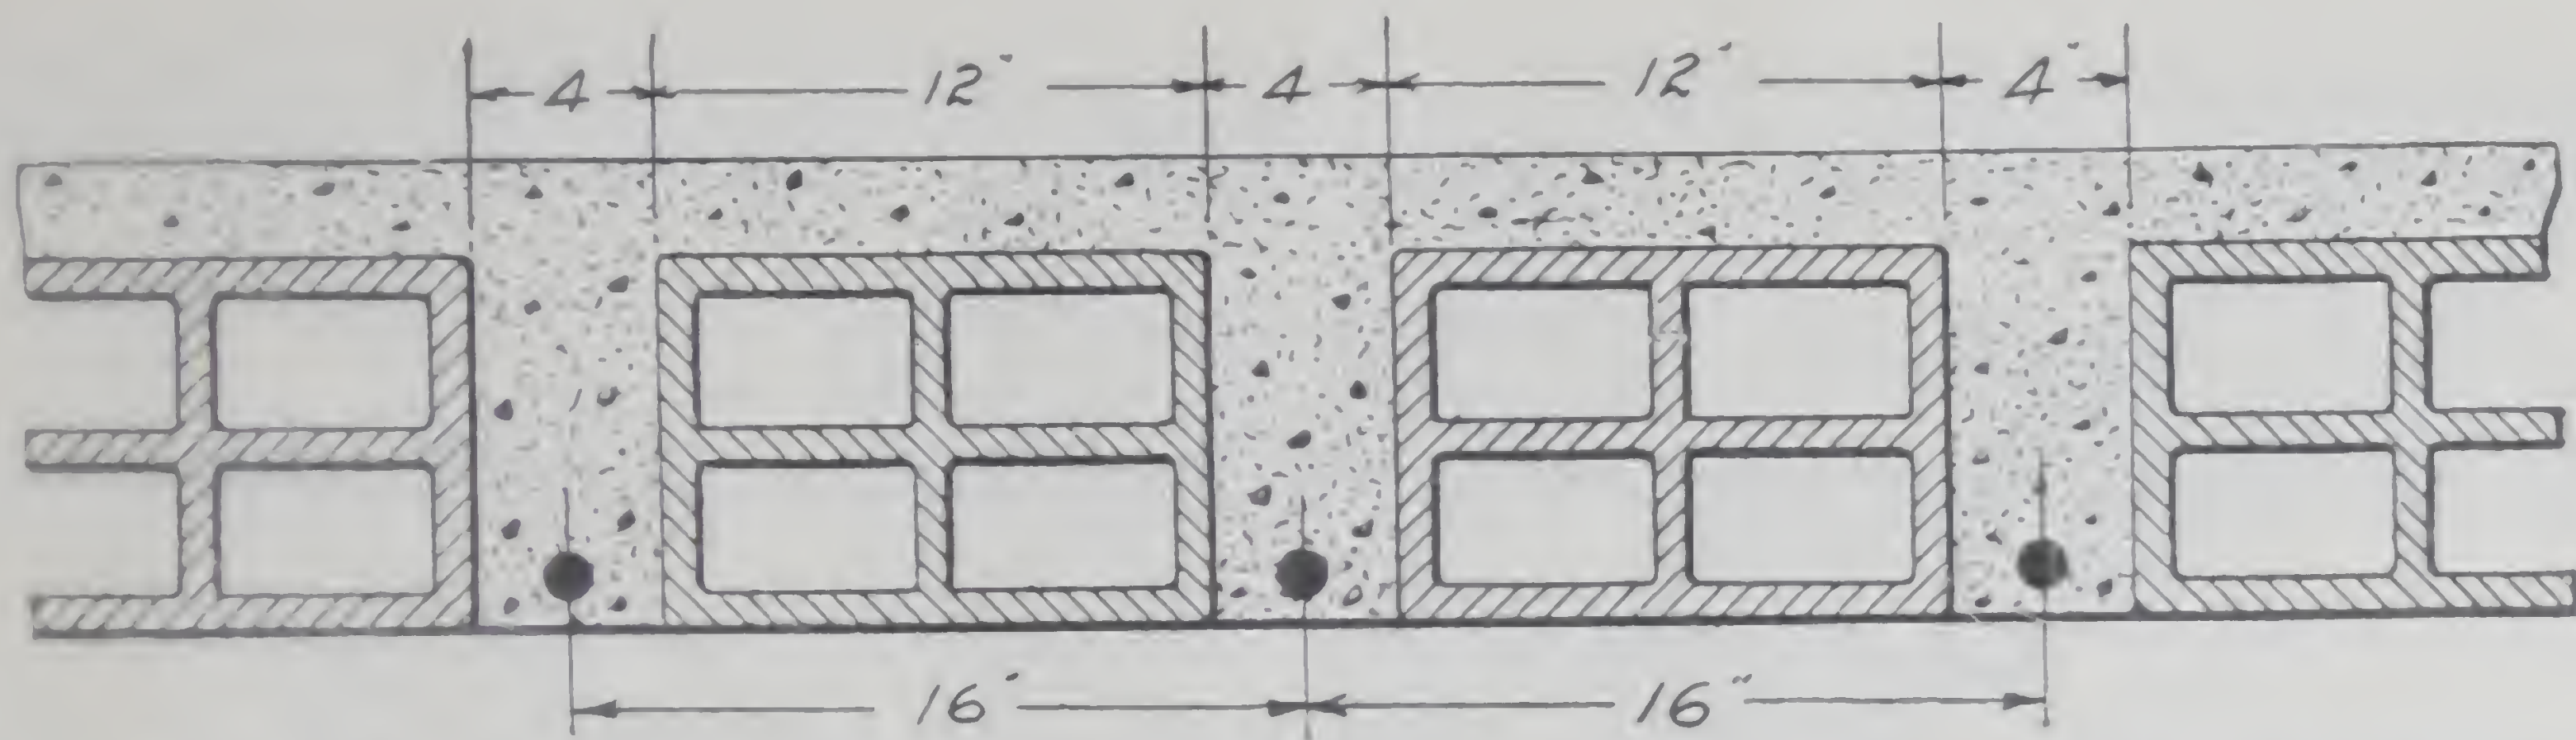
CLAY TILE FILLERS ADD TO THE STRUCTURAL STRENGTH WHEN USED WITH CONCRETE JOISTS.
